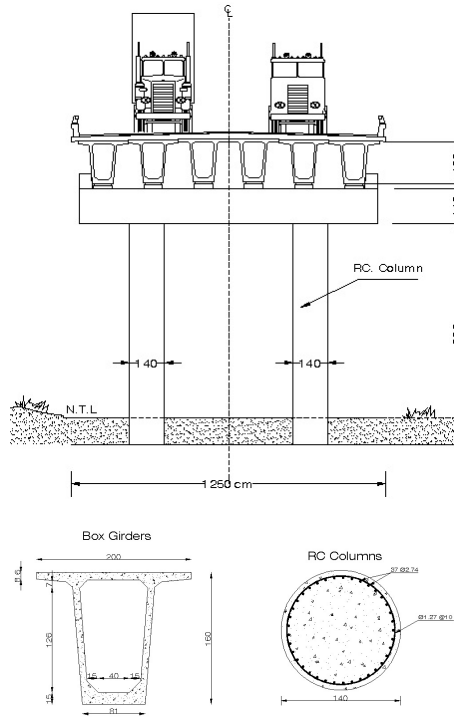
Plane, vertical view and details of the structure under analysis [cm].
